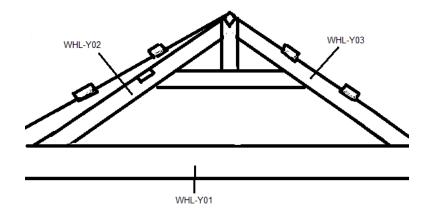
Sketch of truss 1, showing the location of samples WHL-Y01–03
